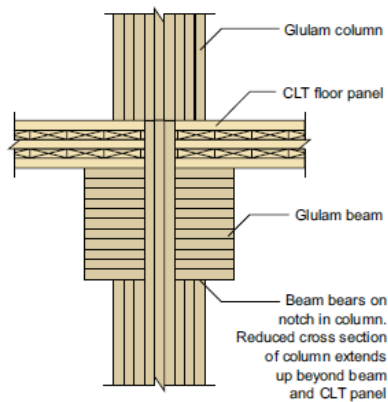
Double beam system with each beam straddling the column, supported by partial bearing on a notch into the column
